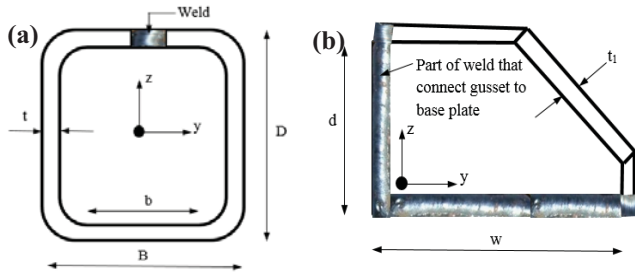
Schematic labelling convention of (a) brace cross-section, (b) gusset plate specimen.
